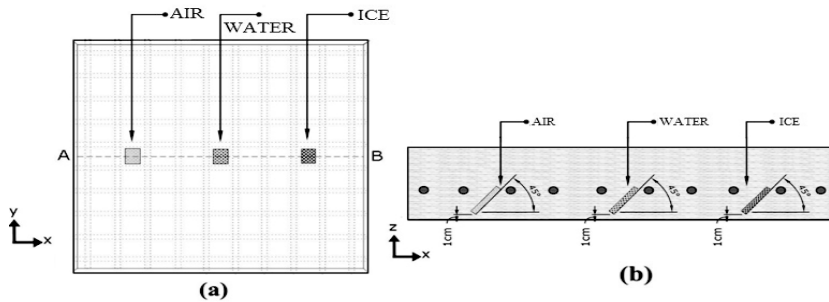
Structure adopted: (a): upper face; (b): Cross-section according to the plan (xoz).
